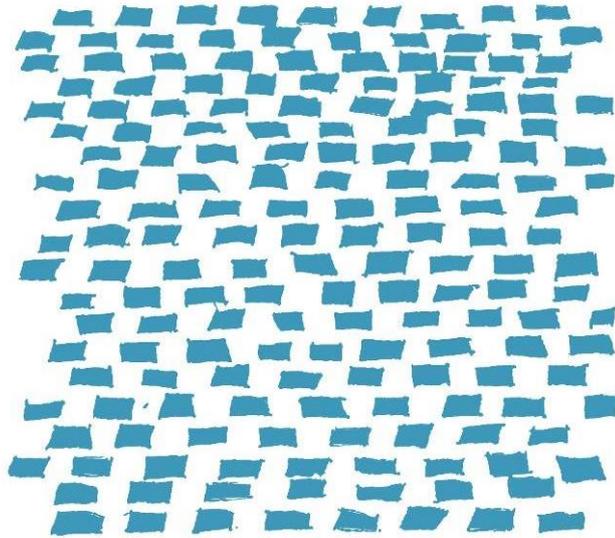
Olivetti Showroom Glass Floor Tiles Drawing.
